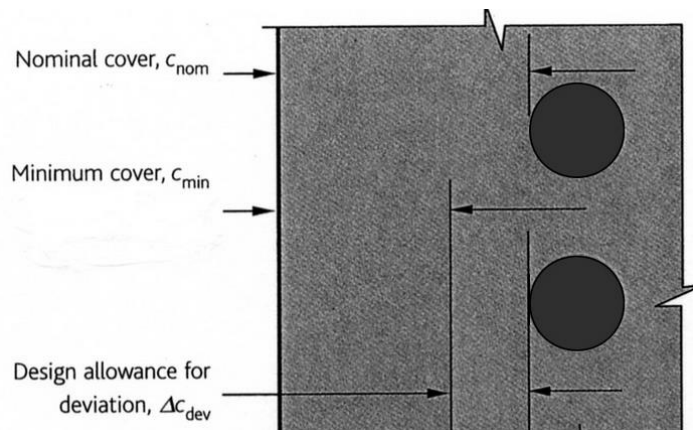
Cover of the concrete (“Cover to reinforcement” n.d.)
